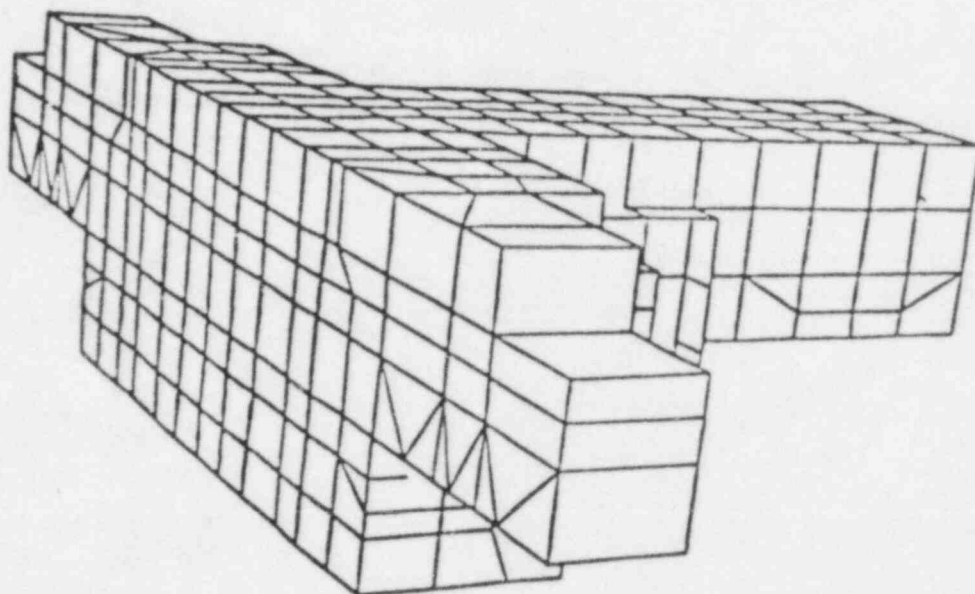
Perspective view of the shear wall structure model looking southwest.
